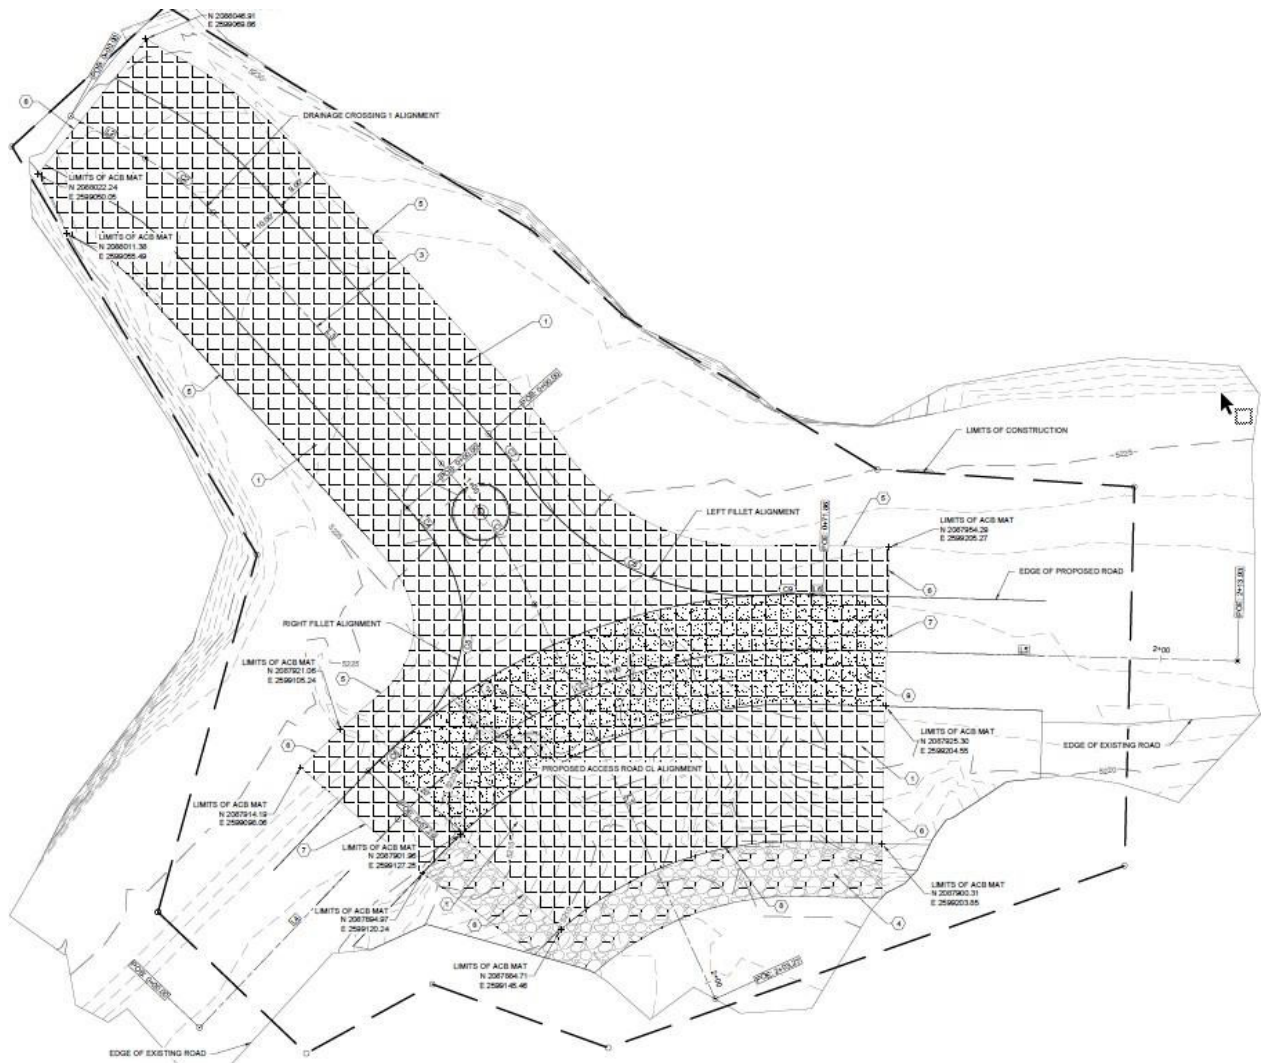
Site Plan-Drainage Crossing 1 and Access Road
